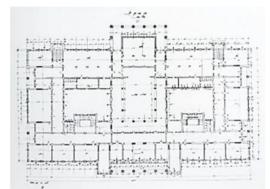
Ground Floor Plan of Gazi Education Institute [15]
